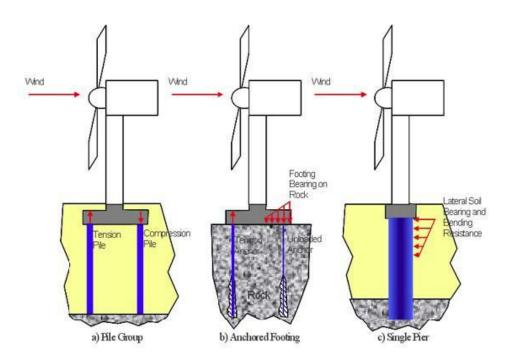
¹⁰⁶ – Different deep foundation systems - a) spread footing supported by two piles, b) spread footing anchored to the bedrock, c) spread footing supported by a single pile.
